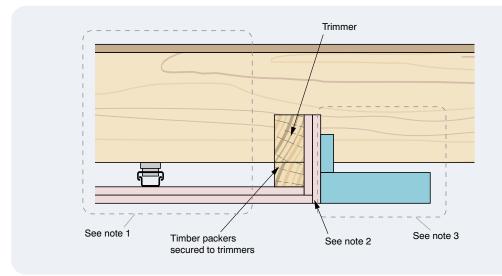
Access panel in a fire-protected floor/ceiling system.
